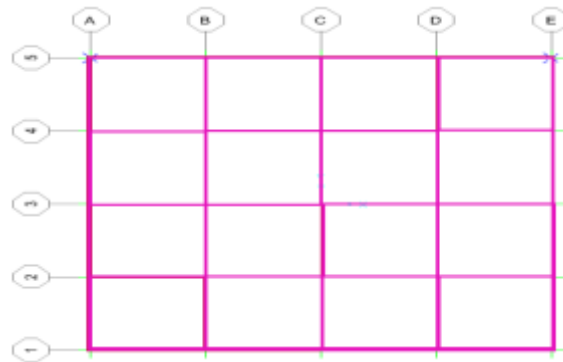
Frame Type (Model of Building Without Shear Wall.)
